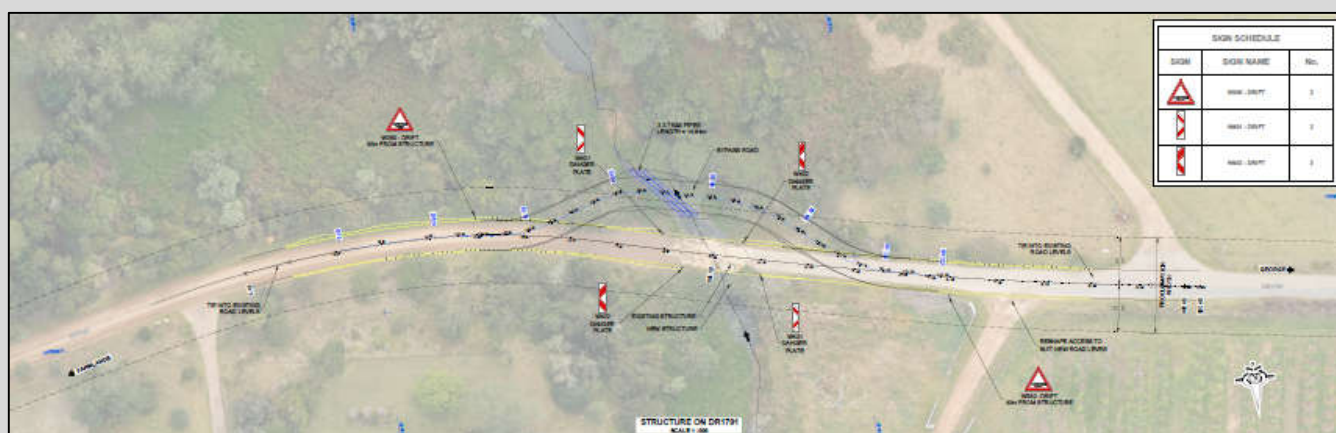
Downstream engineering design for the proposed causeway construction along DR1791, (Hatch Engineering, 2025).
